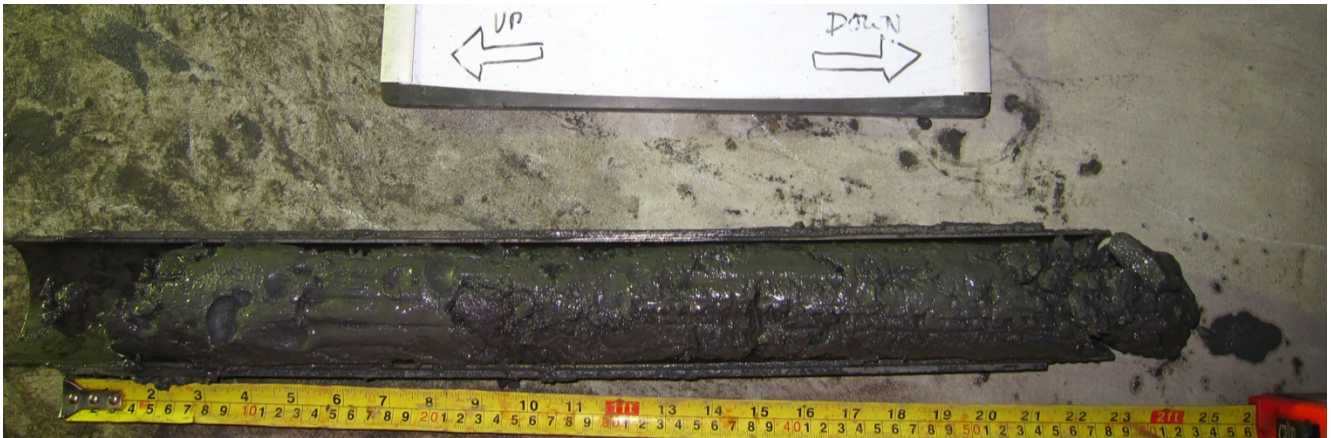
KC12-OVB44 LPT 7 of 10 (10.98 m – 11.58 m)
